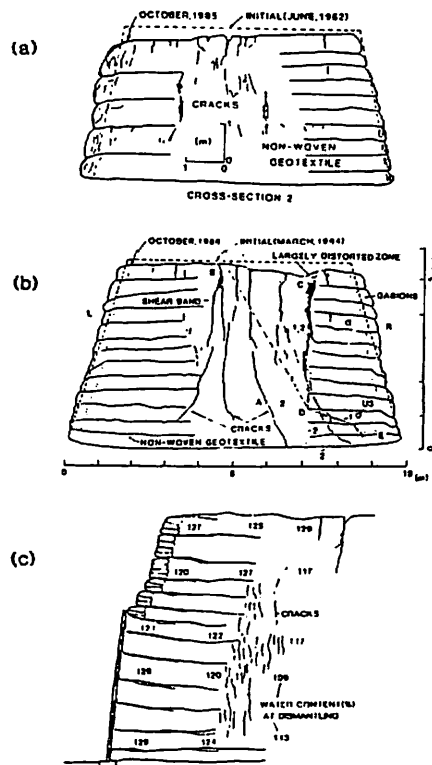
Cross-sections of test embankments. (a) No.1, (b) No.2 (c) Kami-Onda (refs 1, 2, 5, 6)
